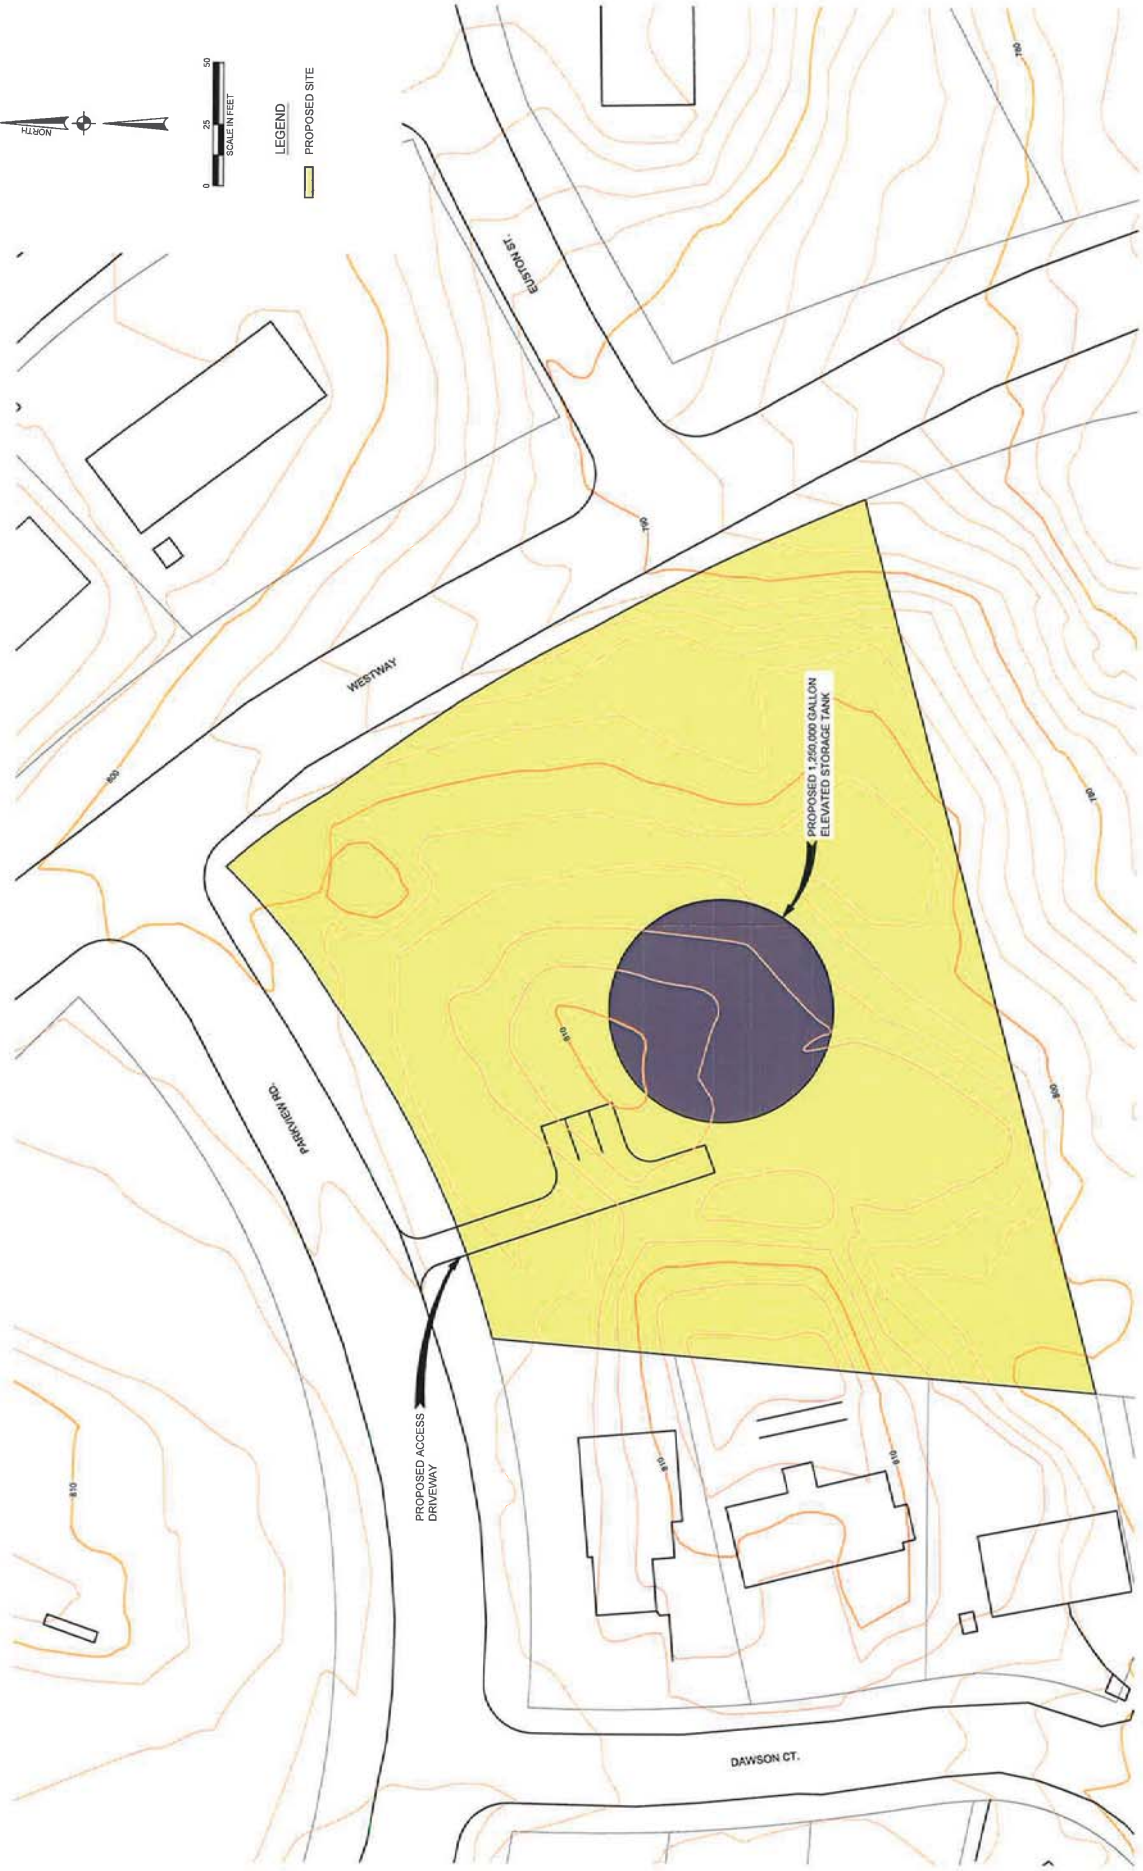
Preliminary Arrangement for a 1,250,000 Gallon Elevated Storage Tank at the Proposed New Site
